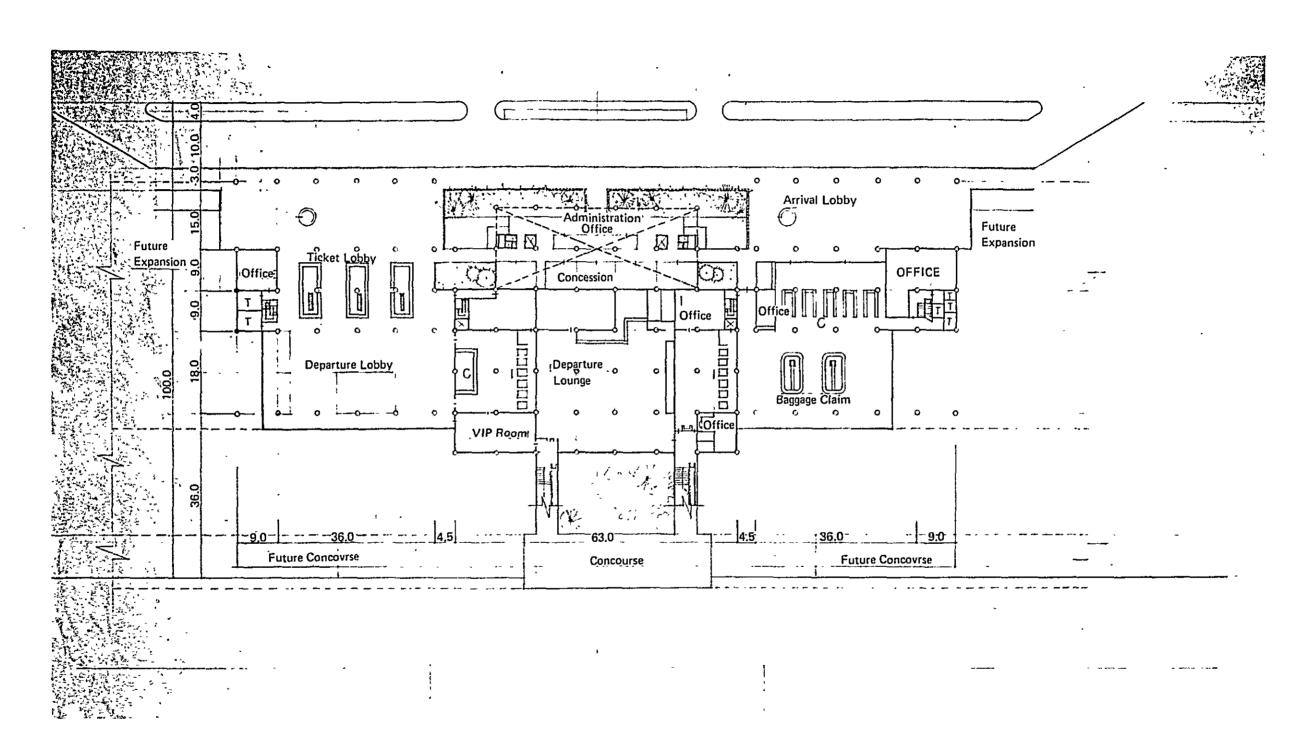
· Proposed International Airport Terminal Building 1st Floor Plan
